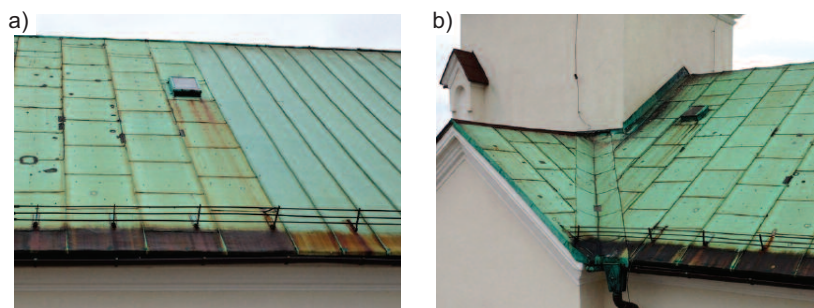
Technical condition of the roof sheathing: a) damp patches visible on the sheathing of the truss over the nave; b) damp patches visible on the sheathing within the church tower
